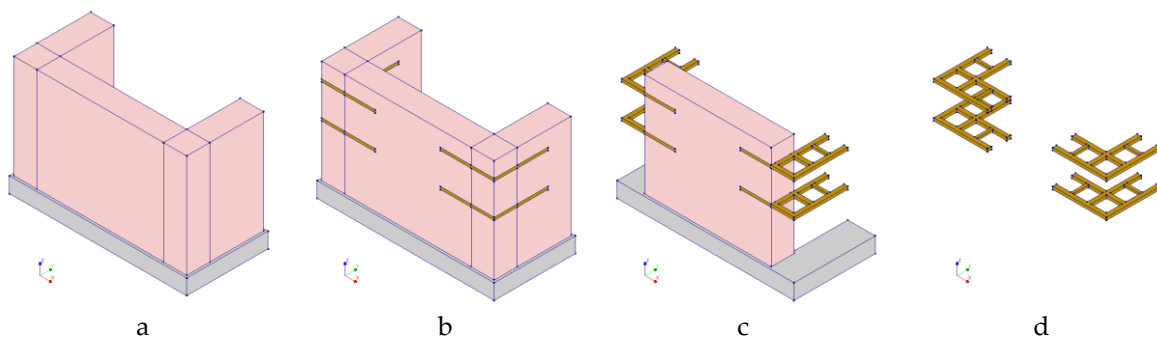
Masonry walls model – (a) Unreinforced masonry, (b) and (c) Timber-reinforced masonry, and (d) Timber laces
